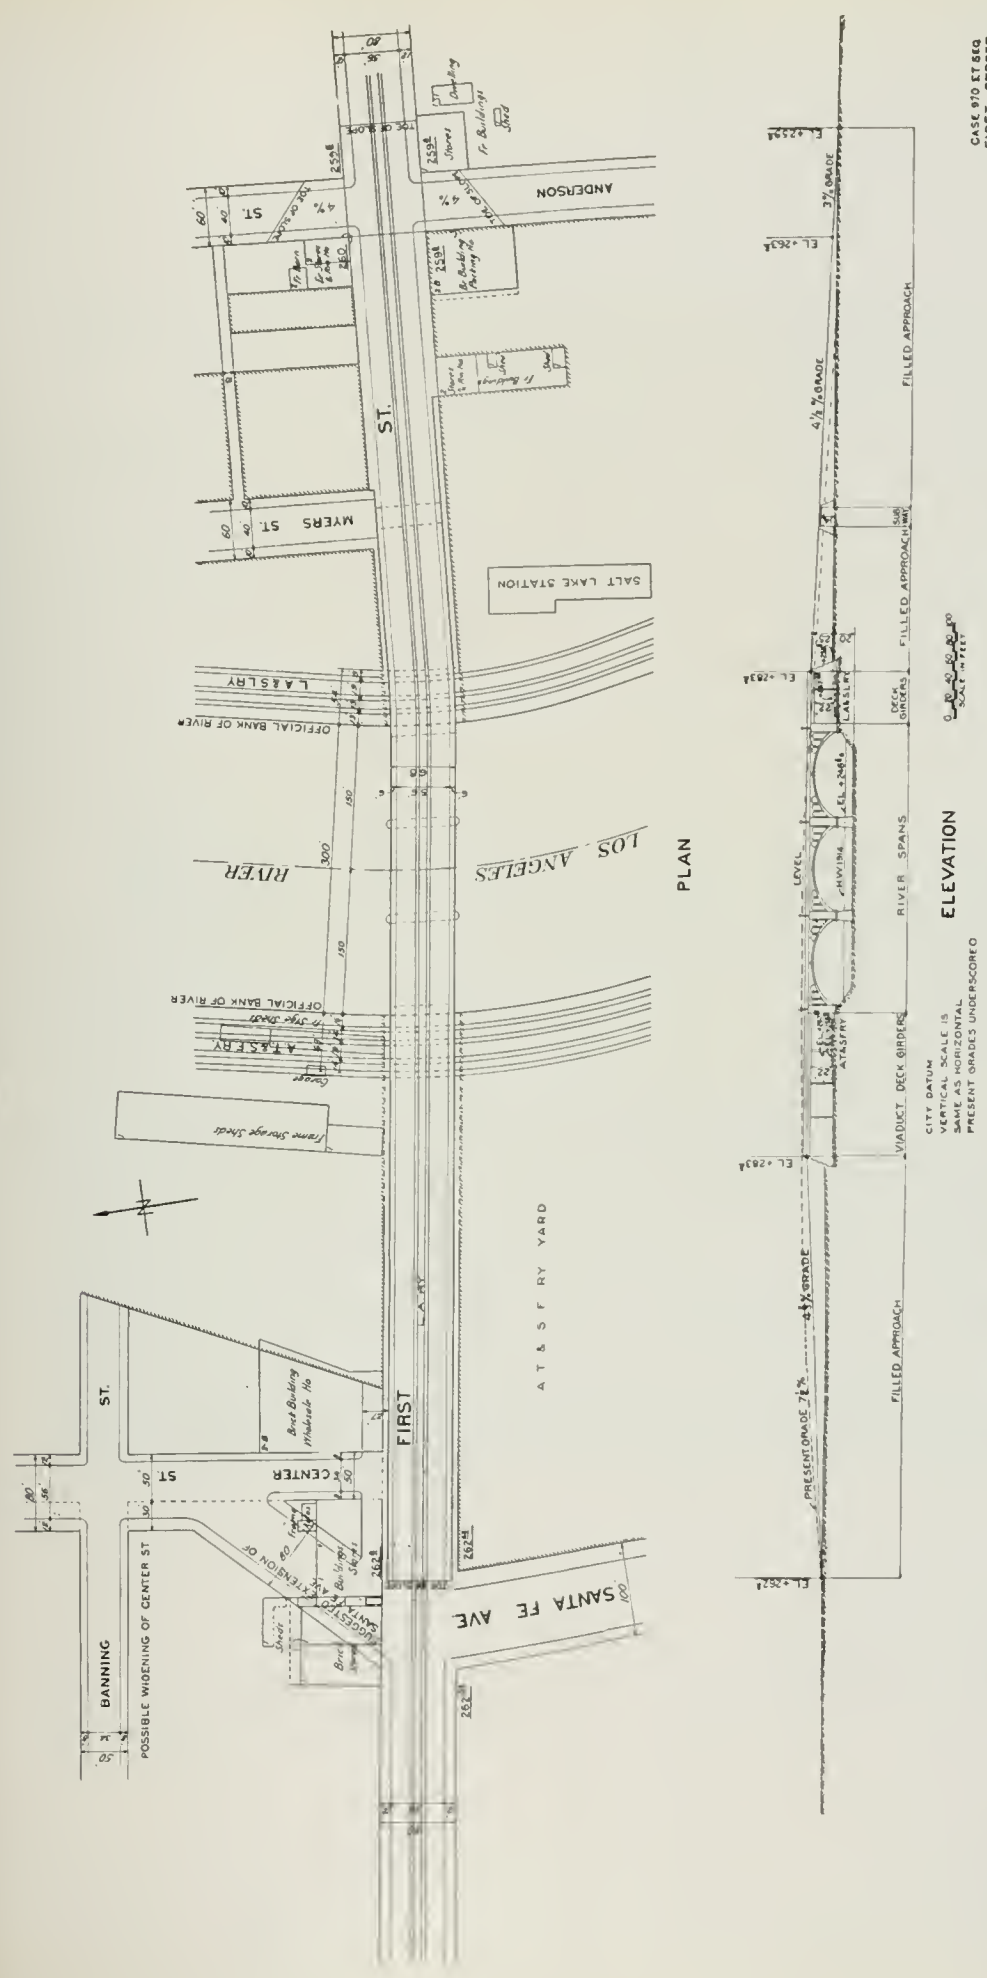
WEST APPROACH TO FIRST STREET VIADUCT
